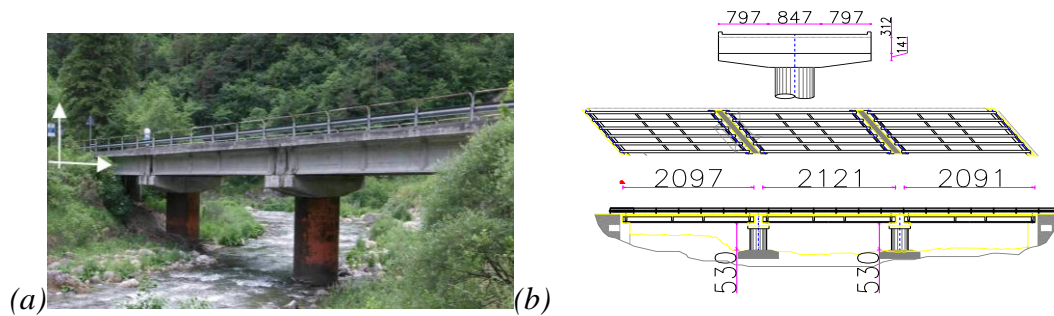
Viadotto San Silvestro (a) overview (b) plan view, elevation and cross-section of deck
